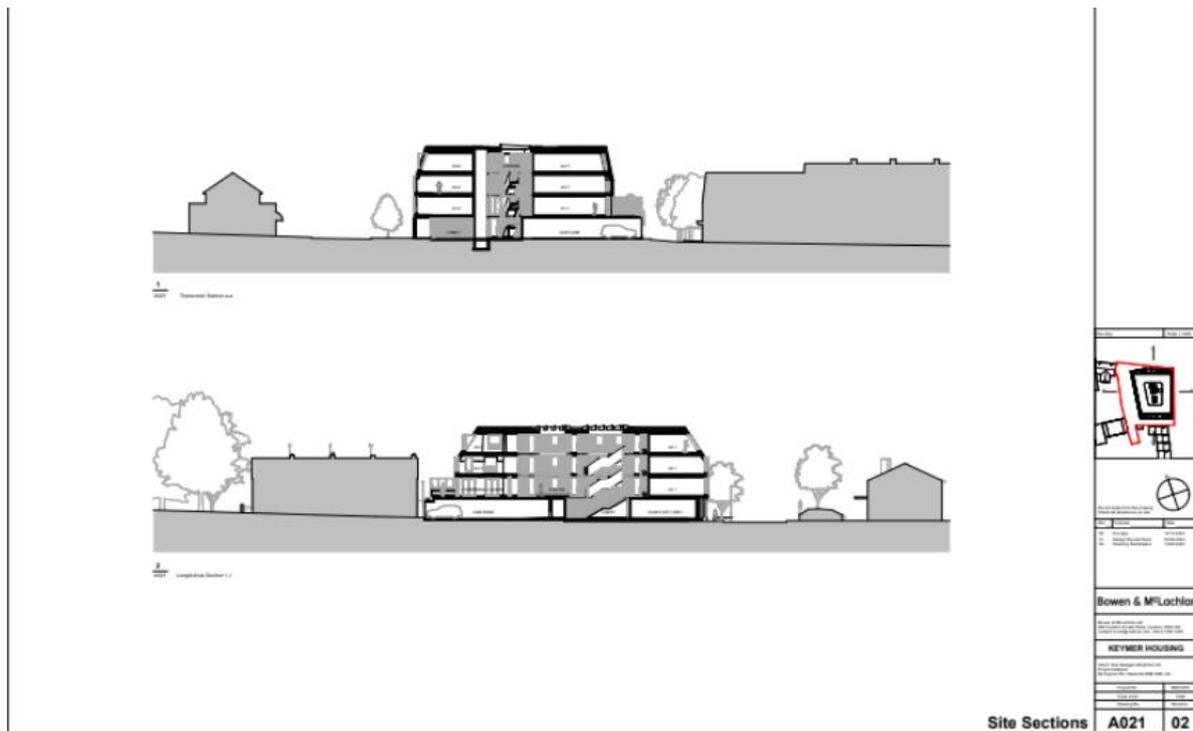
East-west proposed Site section © ©Bowen and Mc.Lachlan Ltd drawing number A021 revision 02.
